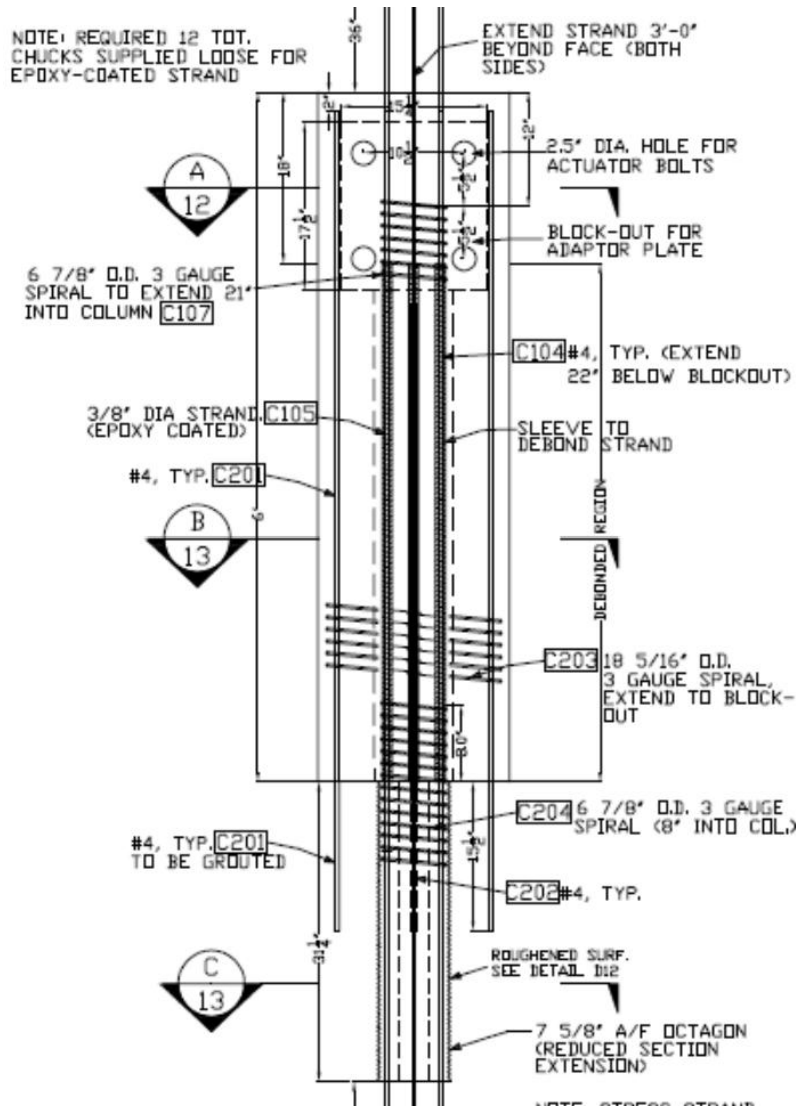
Specimen PreT-CB-CONC elevation (Davis et al. 2012)
